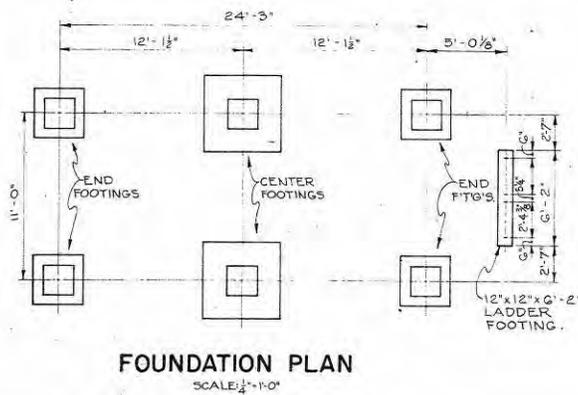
Cargo net mock-up, foundation plan, Fort Bragg, NC, 1952 (standard drawing 28-13-32 sheet 1 of 2; cargo net mock up, plans and details; 1 April 1952).
